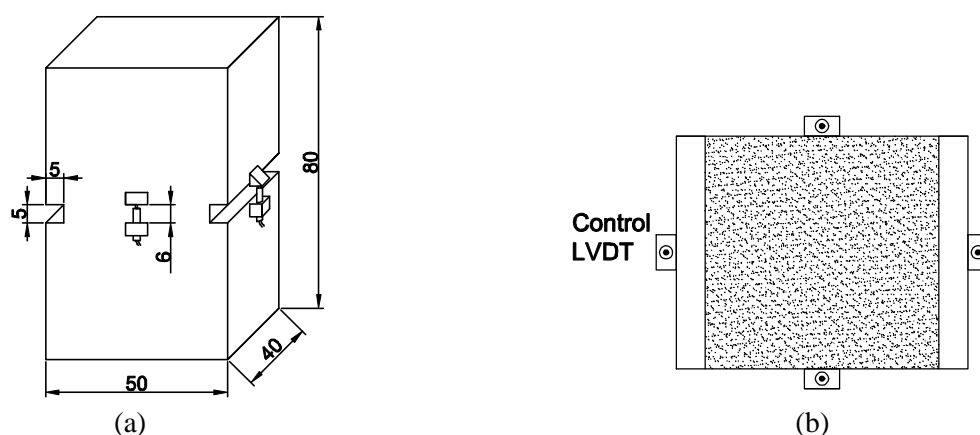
Geometry of the specimens; (a) dimensions of the specimens and location of the LVDTs; (b) definition of the control LVDT
